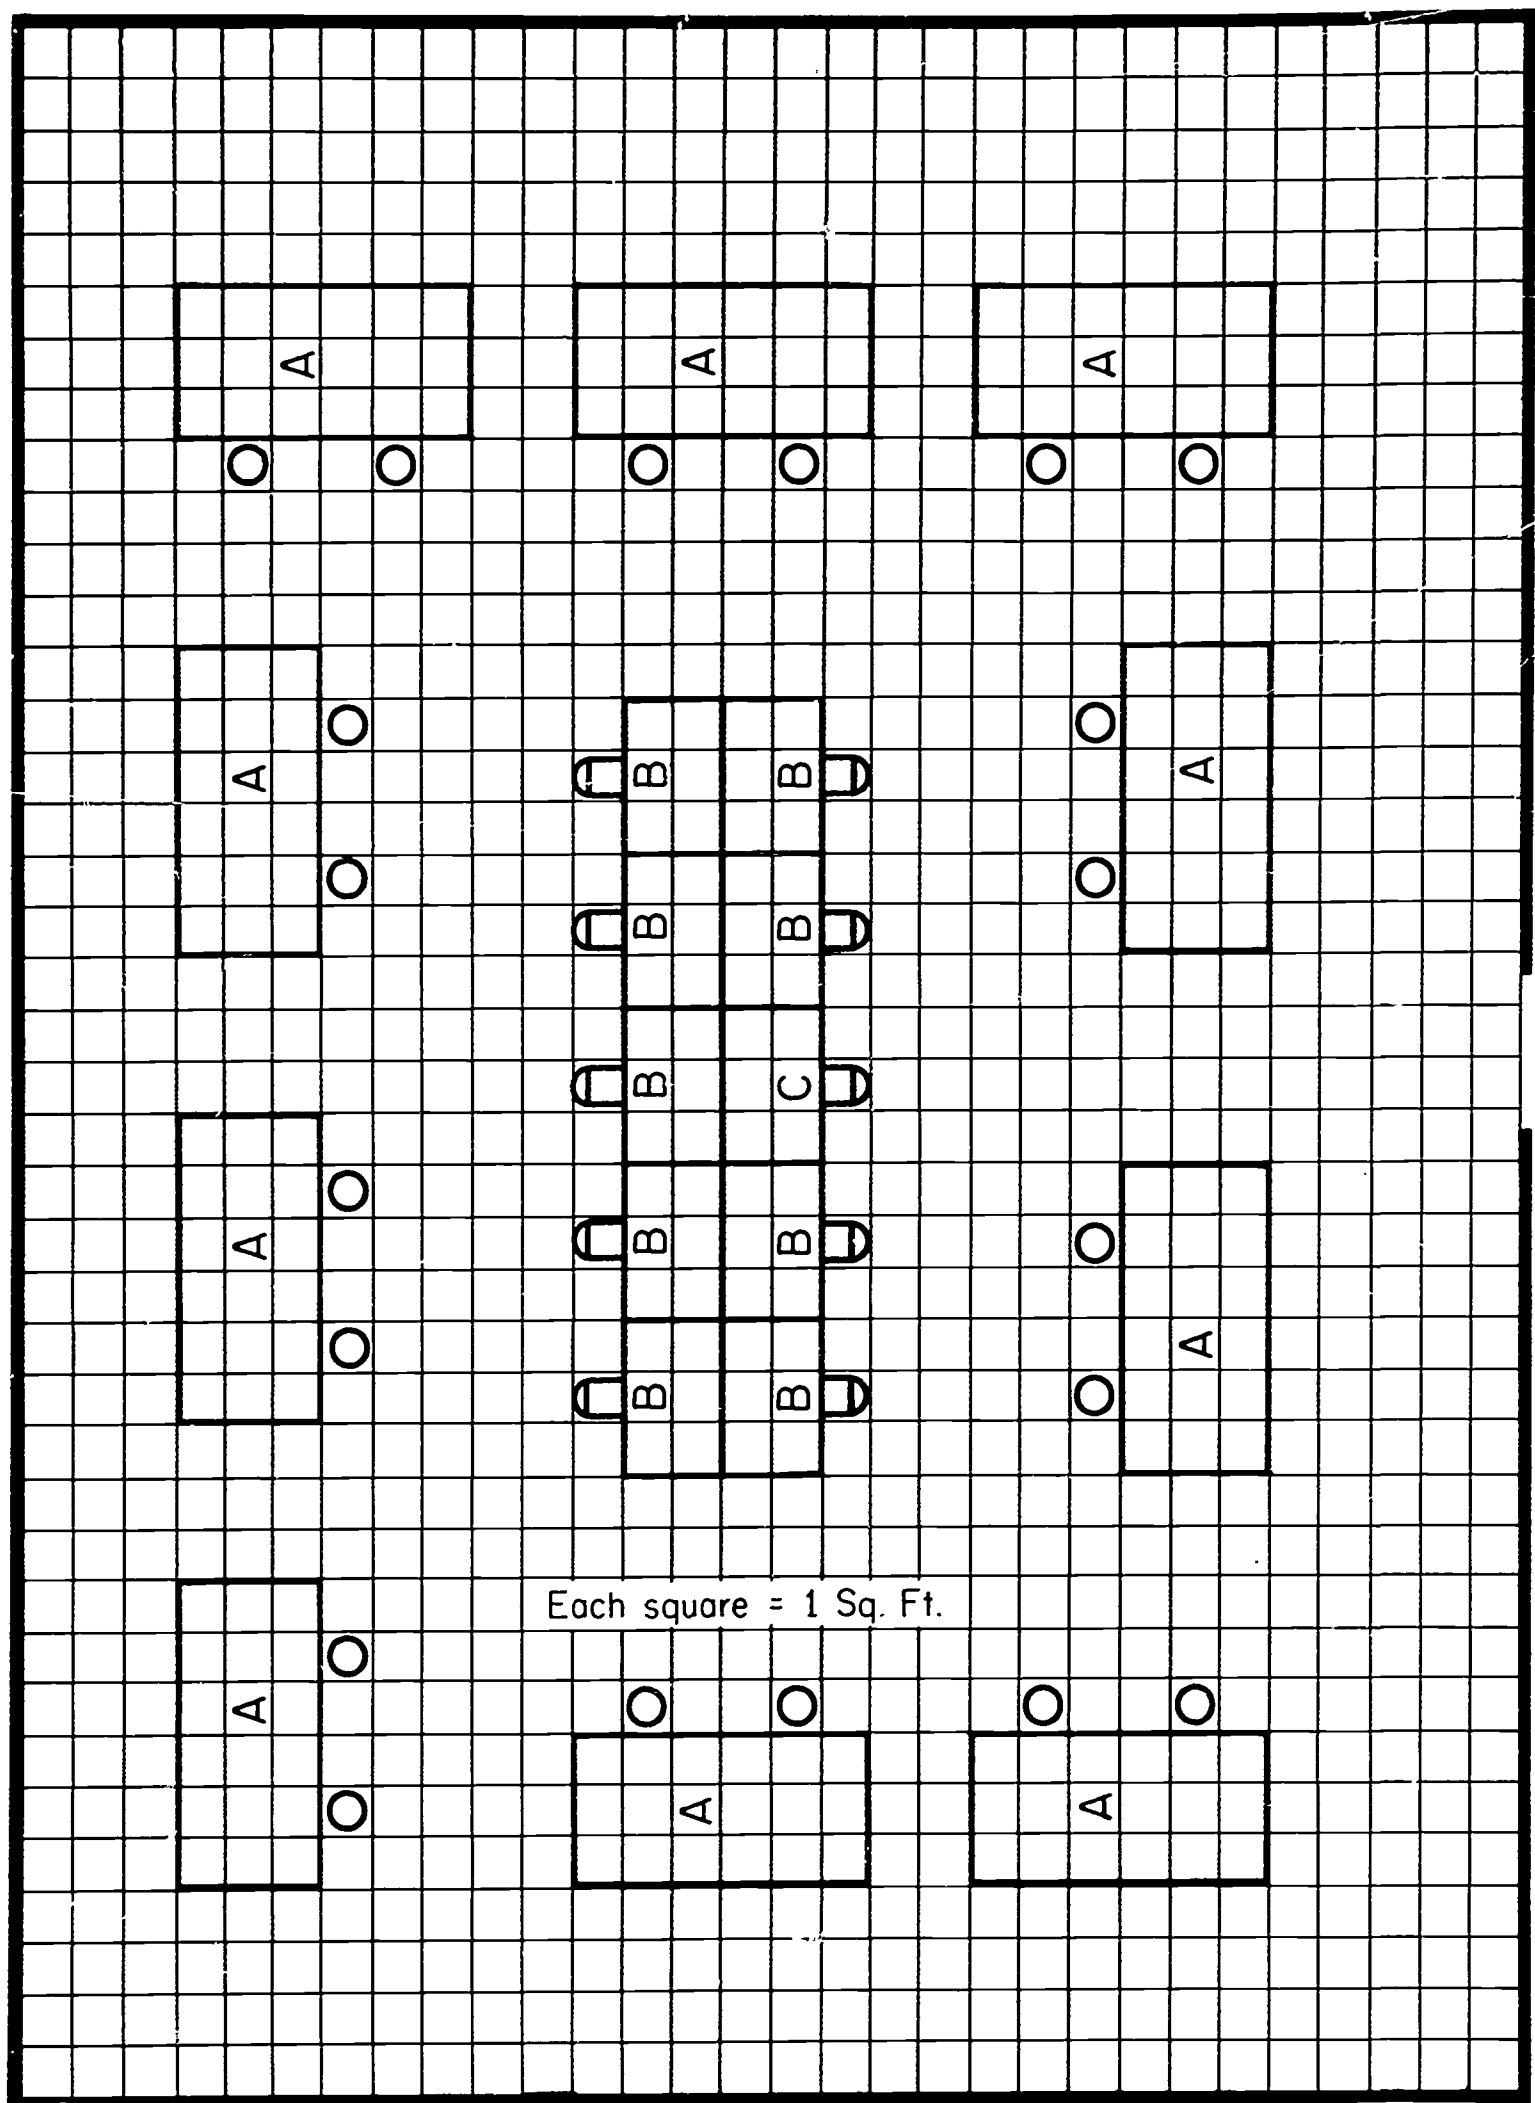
A floor plan of laboratory work stations and calculating tables. Instructor can observe all work stations (A) from central location (C). Allows 56 sq. ft. per station. Space around outside is for storage, chalkboards, special equipment, etc.
